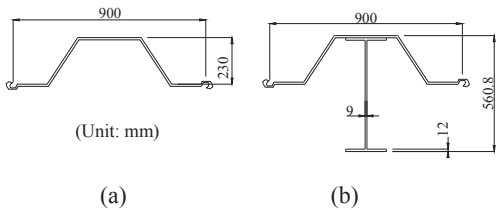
Geometry of the wall elements used in case 1 and 2: (a) secondary element (NS-SP-10H Hat pile); and (b) primary element (NS-SP-10H Hat pile welded with an H section)
